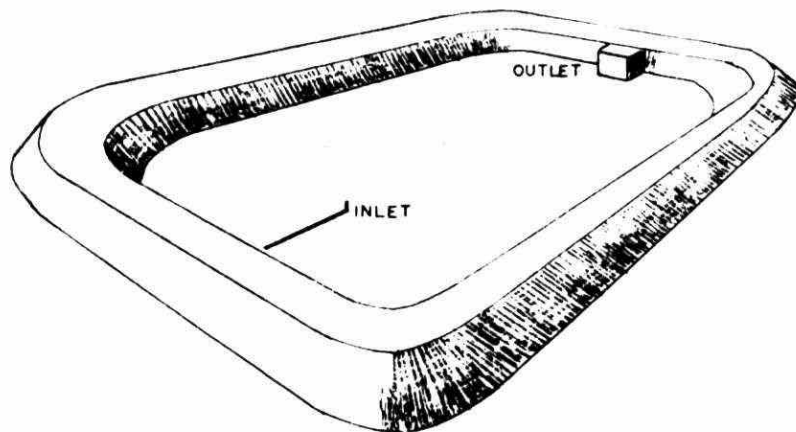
WASTE STABILIZATION POND The pond has a flat floor and the normal water depth is about five feet.
